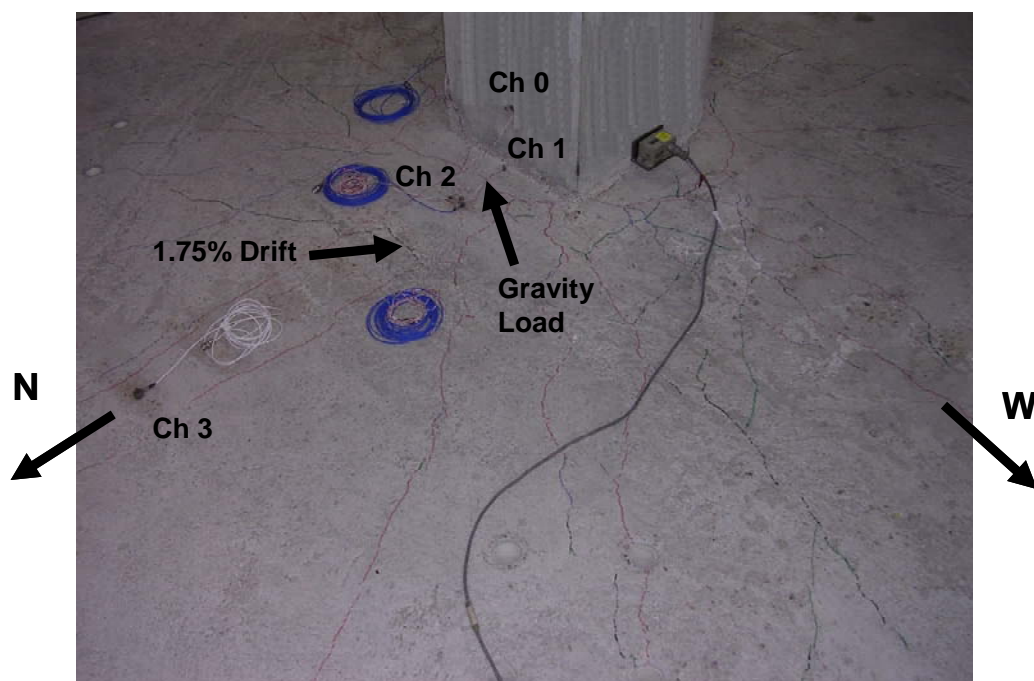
Cracking of Specimen L0.5 in the NW quadrant
